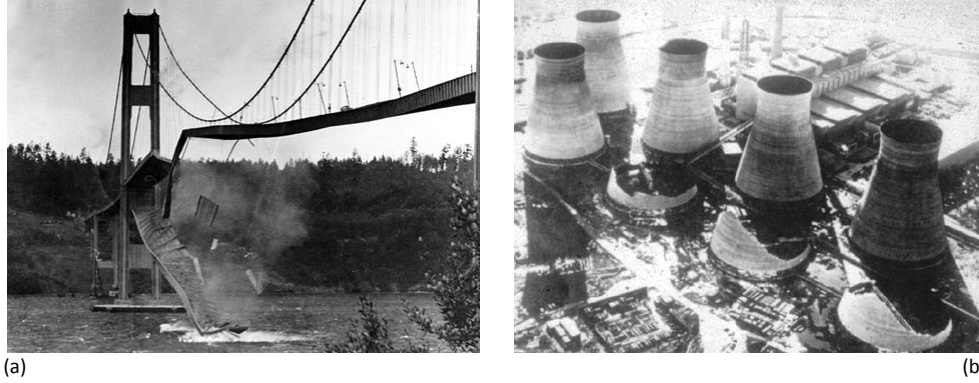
Major structural failures: a) Tacoma Narrow bridge (1940); b) Ferrybridge cooling towers (1965).
